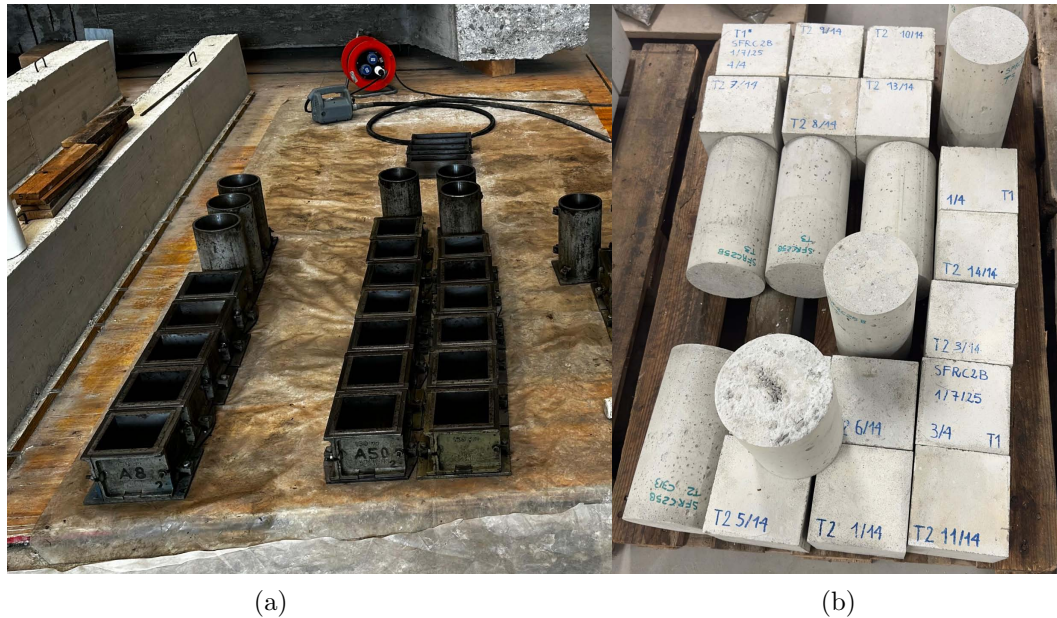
Specimen preparation for compressive strength and elastic modulus tests: (a) Steel moulds for casting concrete cubes and cylinders; (b) Cast cube and cylinder specimens.
